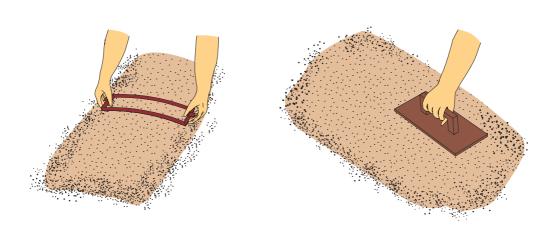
Shape the surface of sand base by using the segment mould to get proper curvature and then smooth and slightly pack the curved sand surface with a wooden trowel.
